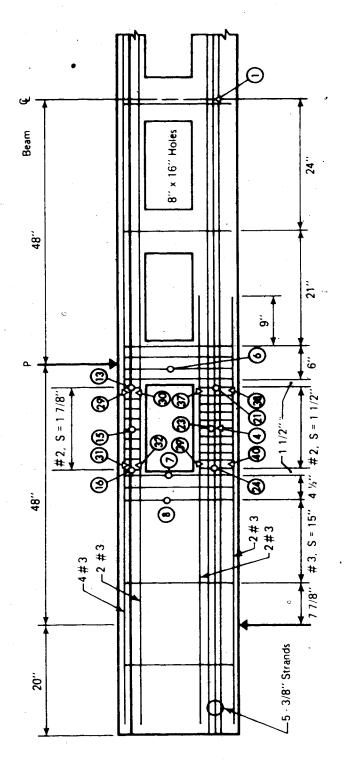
Reinforcement Details and Strain Gage Locations for Beam 17-16-4
